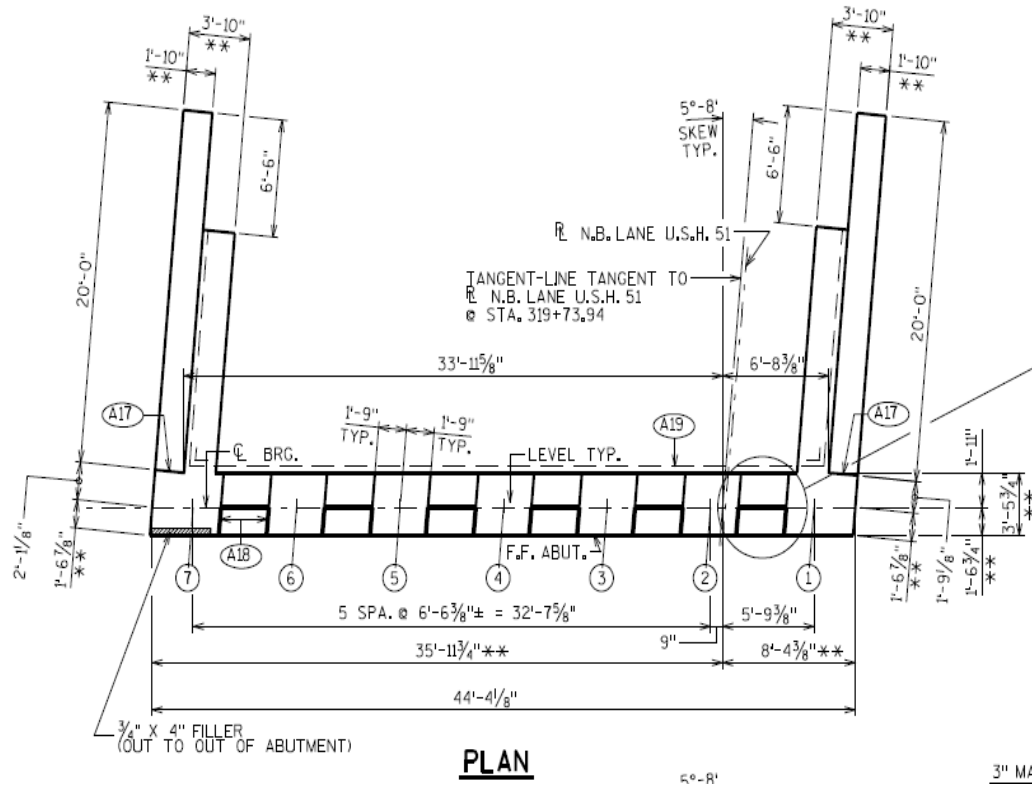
Bridge plans from Highway 51 at Bear Tree Parkway (bottom). Shown here in the beam seat plans is the orientation of the wing walls.
